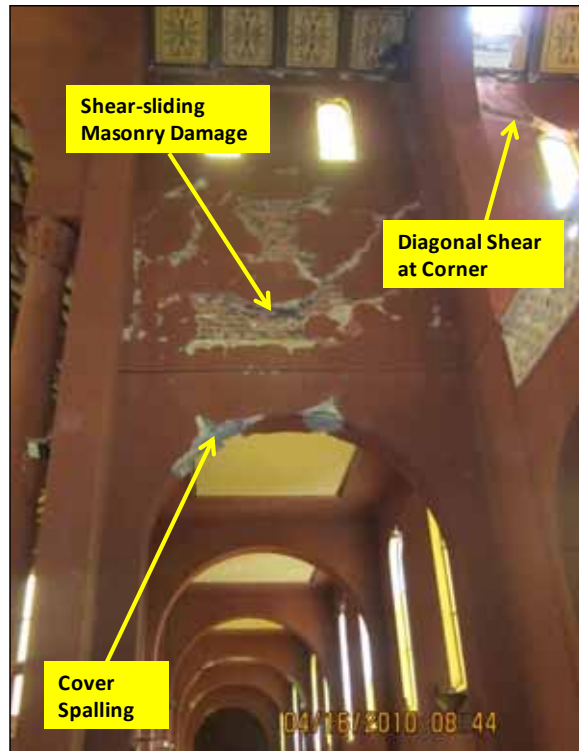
Side isles damage to RC arch and masonry wall
